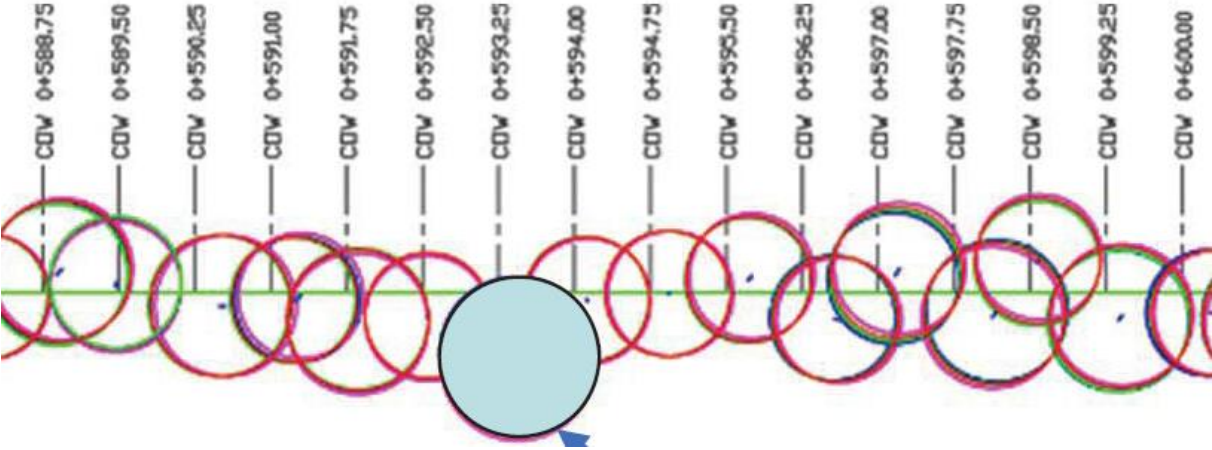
Jet grouting cut-off. Courtesy: Diavik A418, Deep Foundations Institute, TreviGroup [3]
